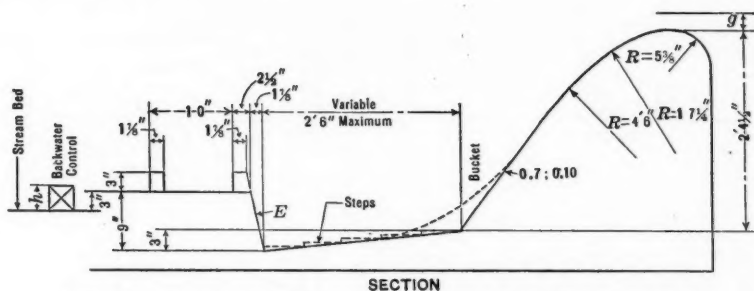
DETAILS OF MODELS WITH STILLING POOL, PIT No. 4 DAM.
